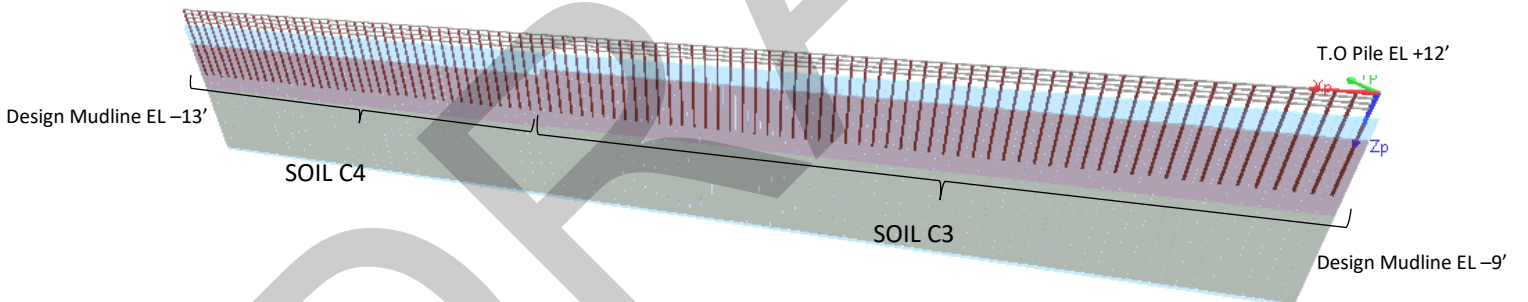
Section 2 Fender Layout - Soil Profile C3 & C4
